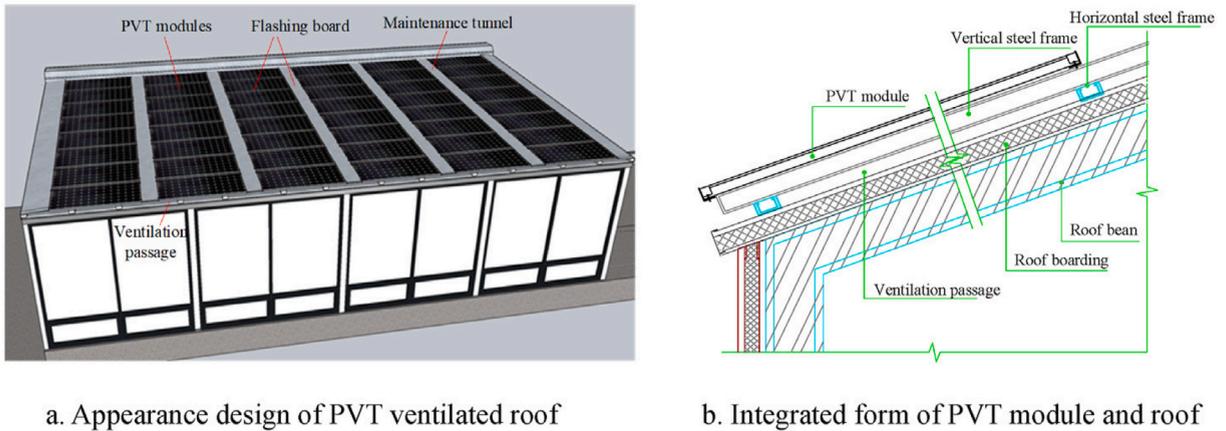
Design of PV/T ventilated roof adopted from ref. [180].
